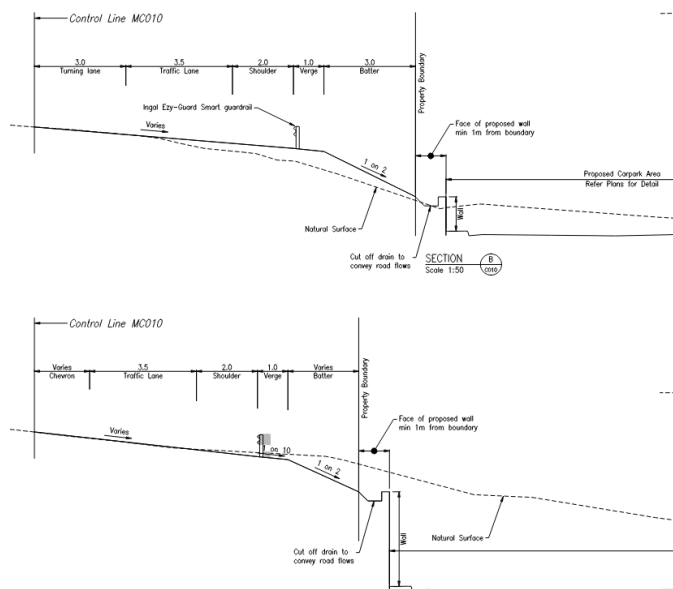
Applicant's engineering sections of proposed retaining wall adjacent the site's frontage
